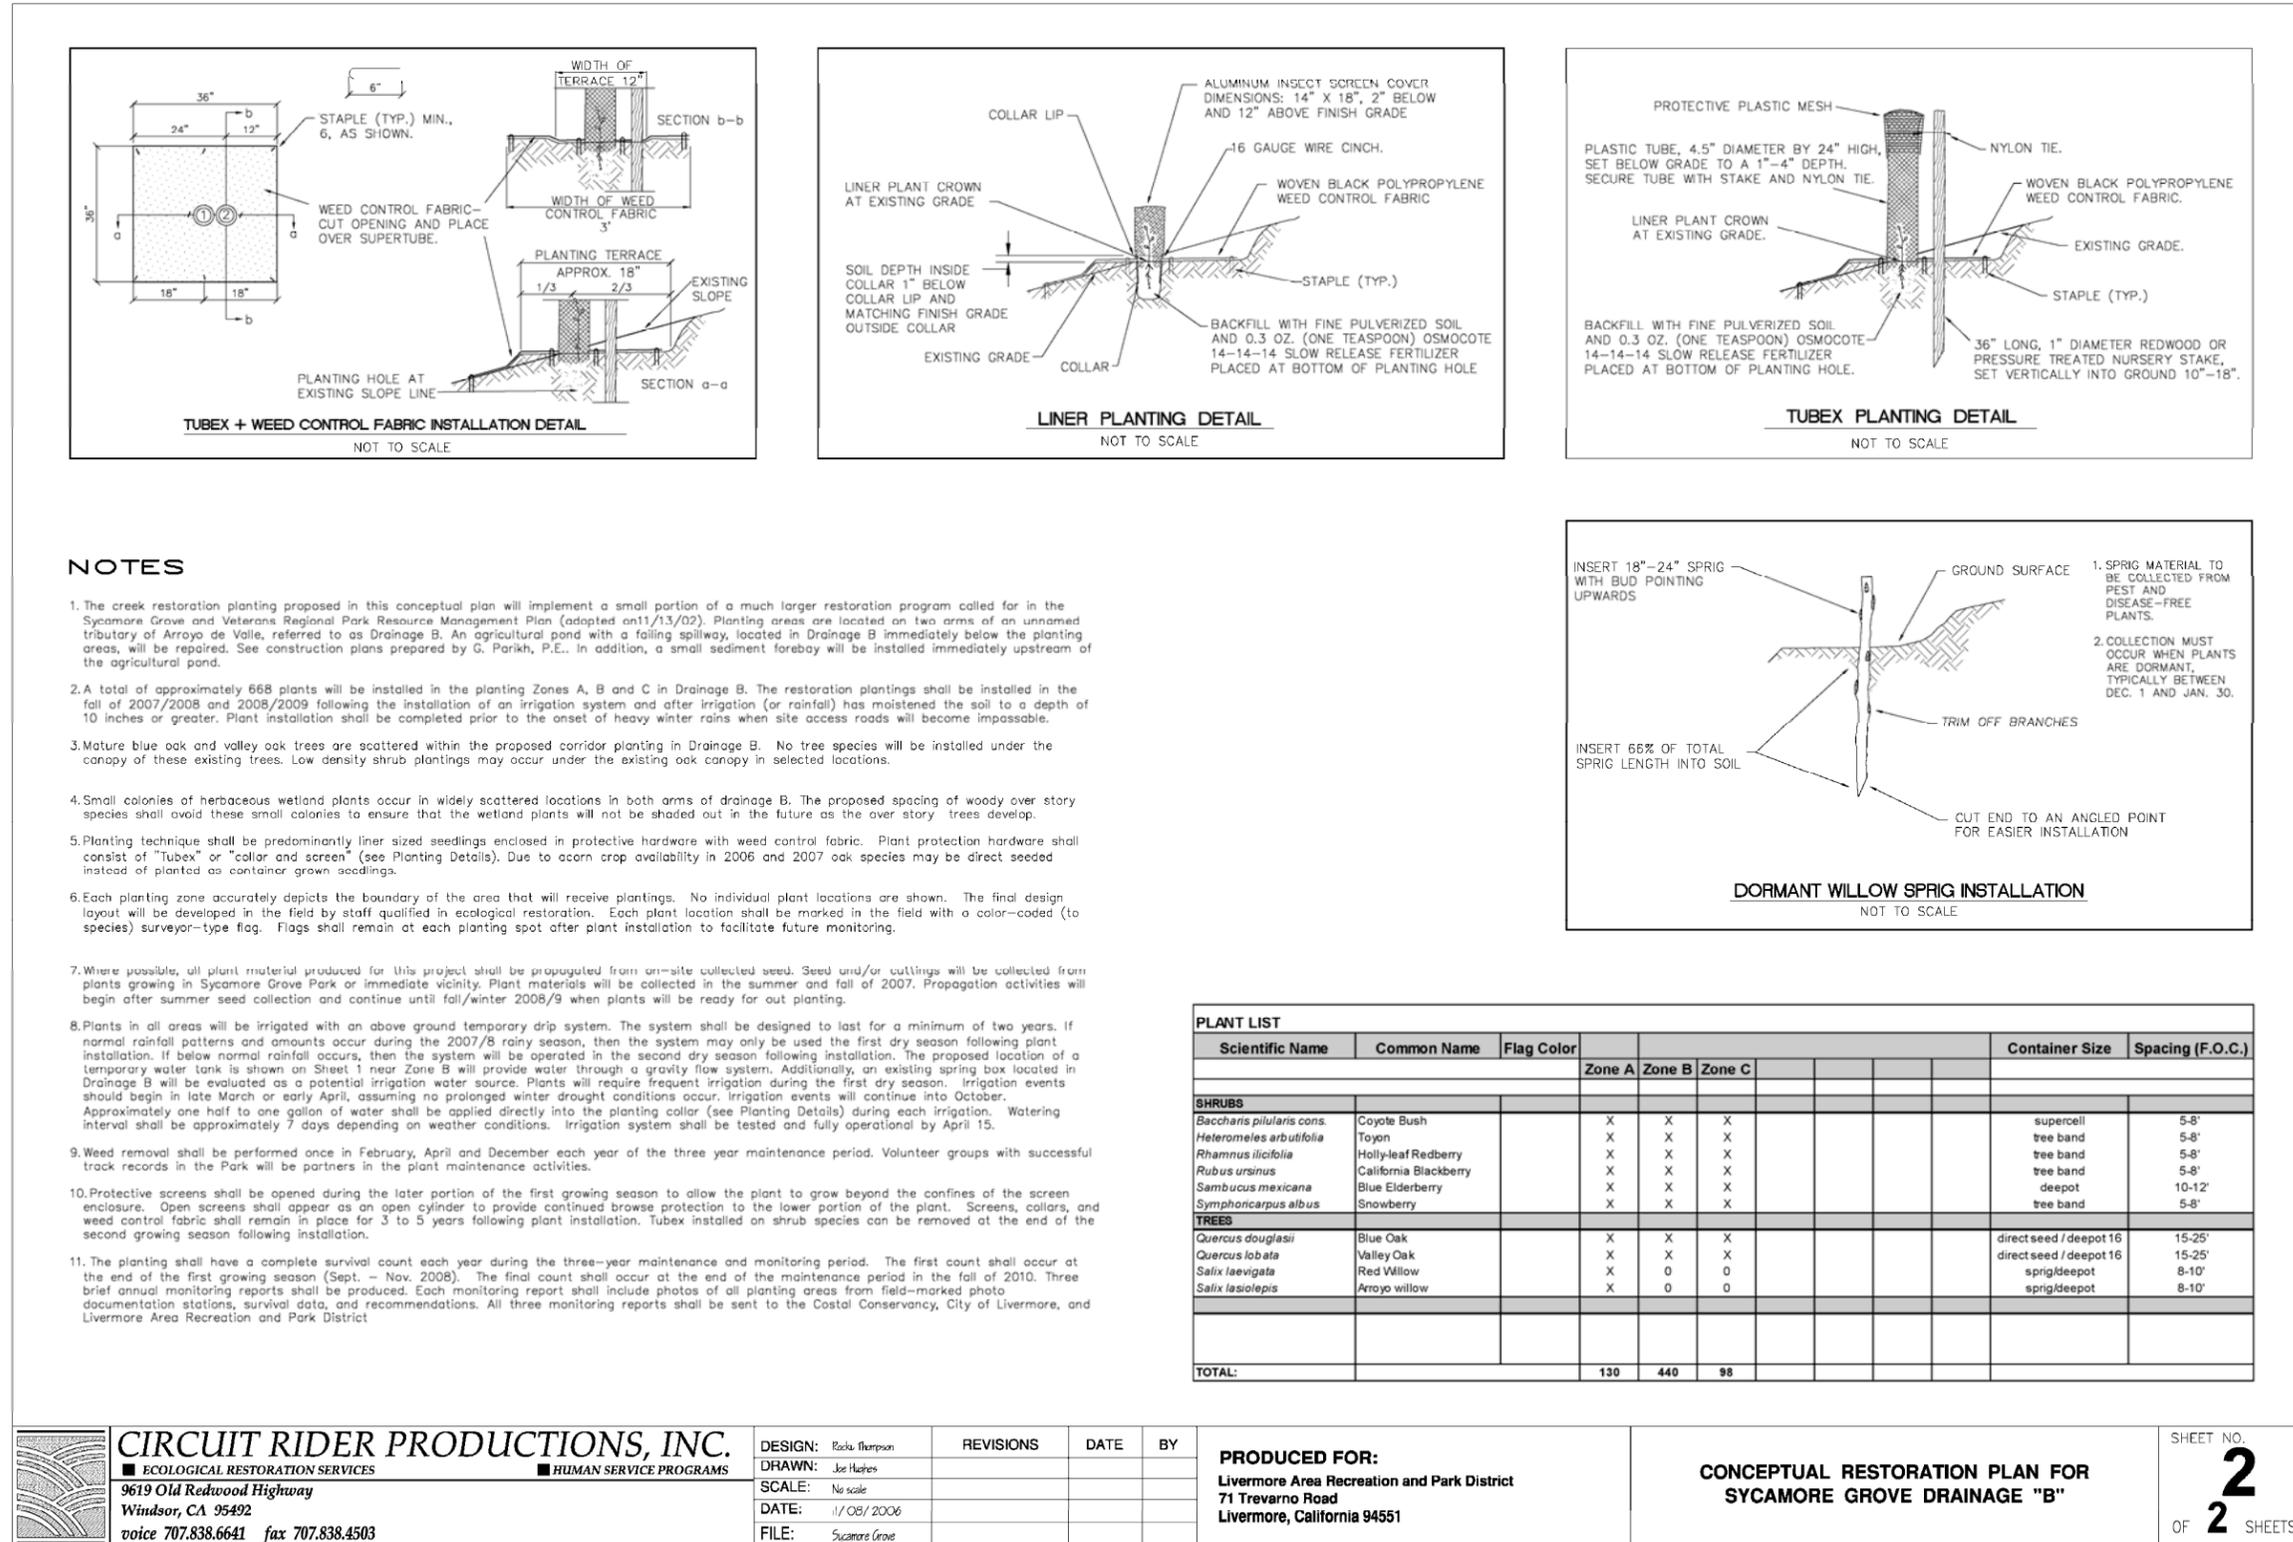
Conceptual Restoration Plan for Upper Drainage B (Sheet 2 of 2)
